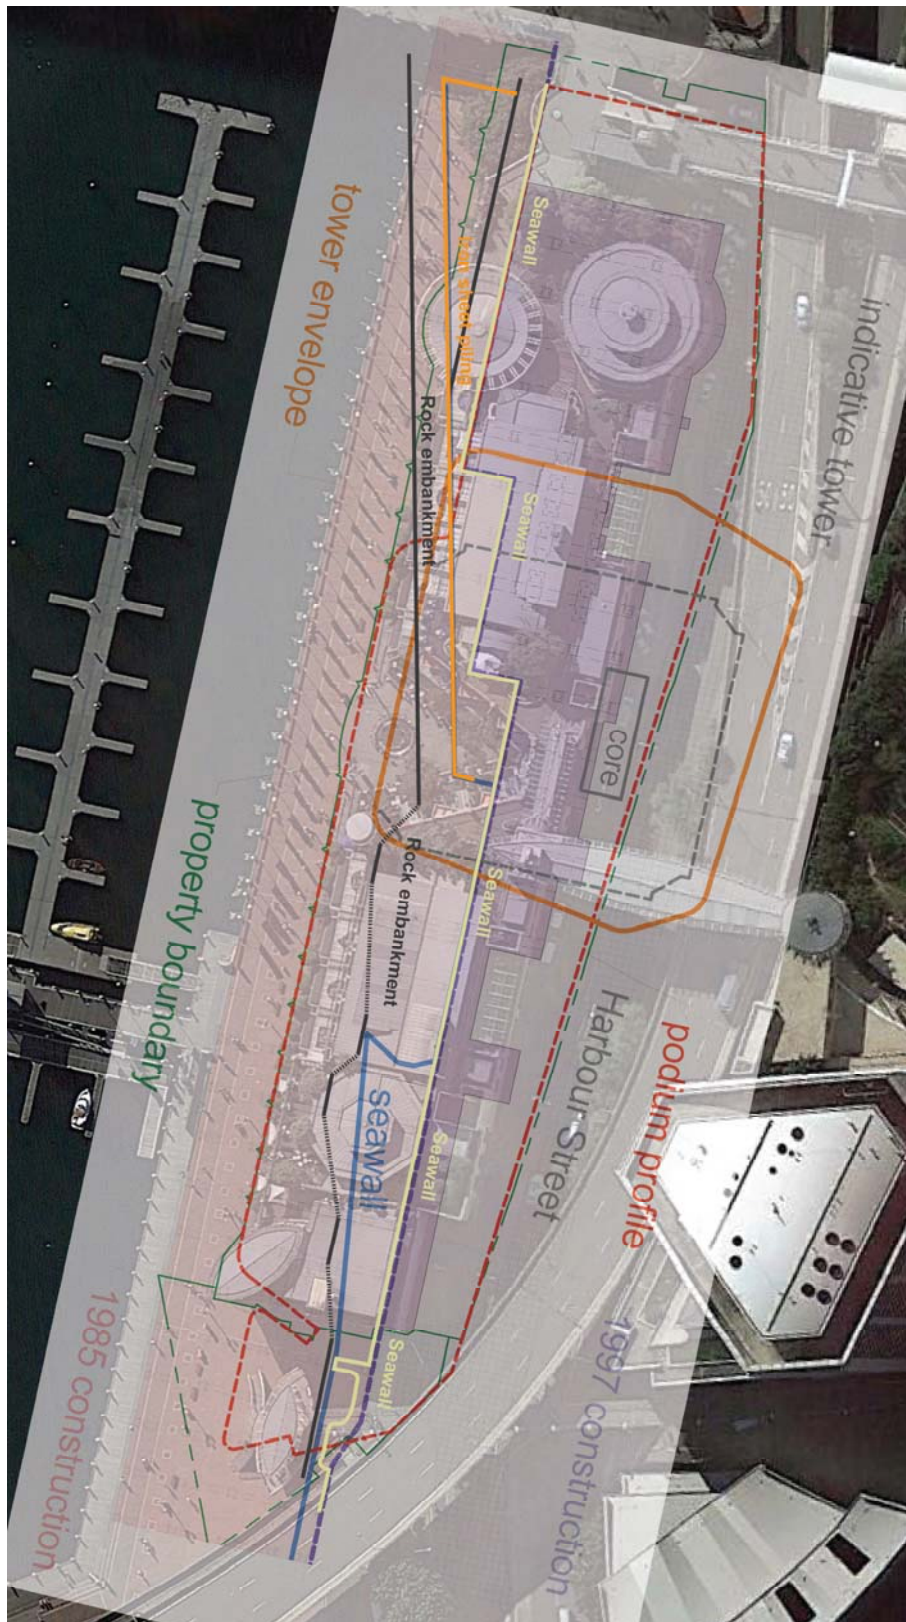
Overlay of 1985 construction (pink), 1997 construction (purple) and seawall as current in 1980s (blue) as well as the seawall (yellow), iron sheet piling (orange) and rock embankment (dark grey) identified in the site inspection.
